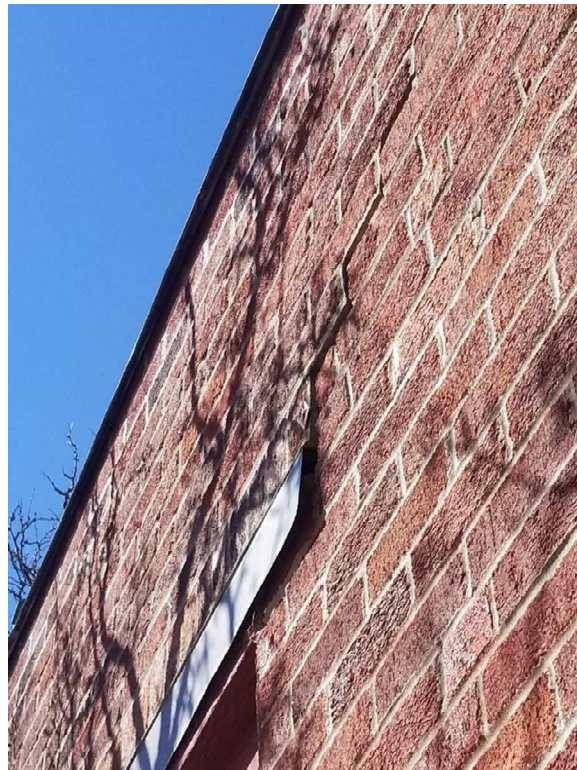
Masonry wall pulling away from the back of the structure approximately 2”.
